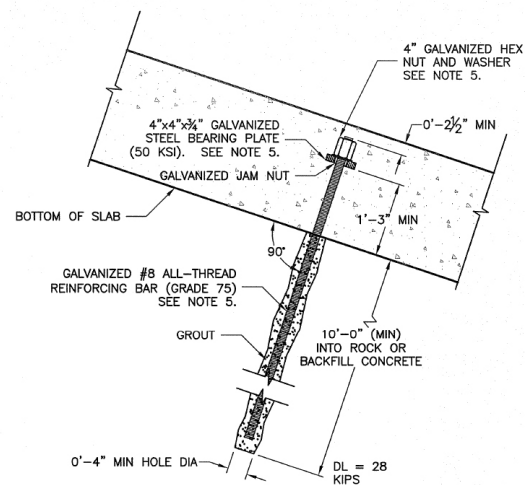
Thread Rod Passive Anchor (Ref. Schnabel Engineering)
